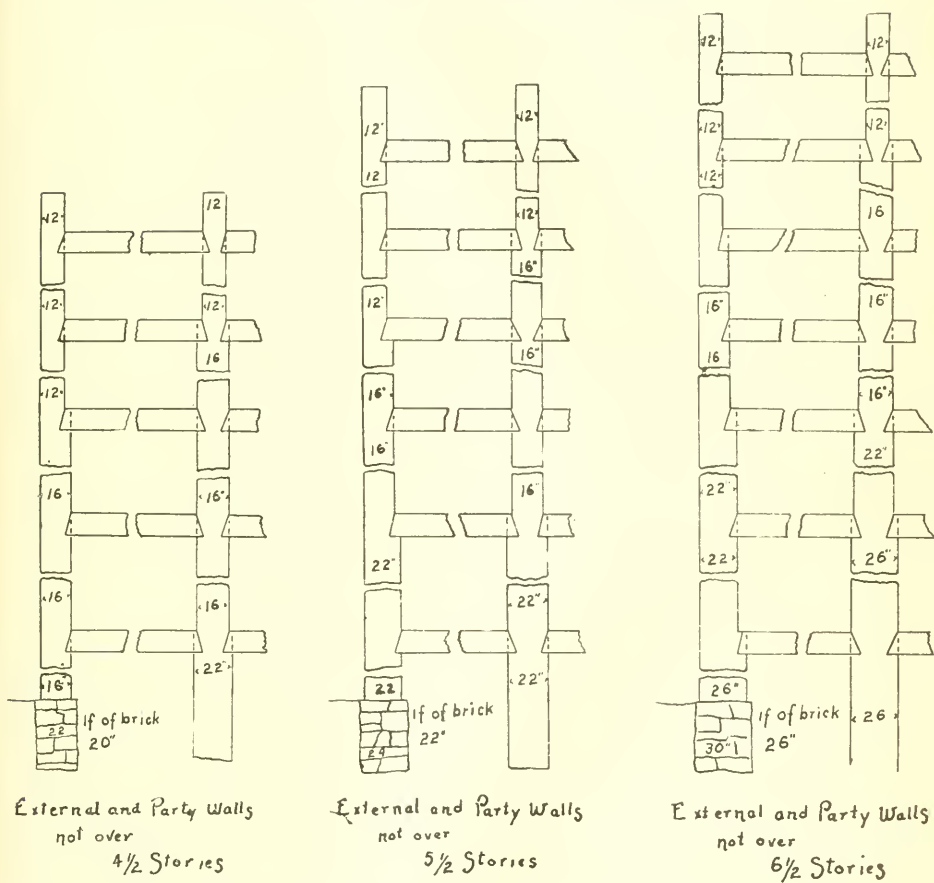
BRICK BUILDINGS OTHER THAN DWELLINGS.
